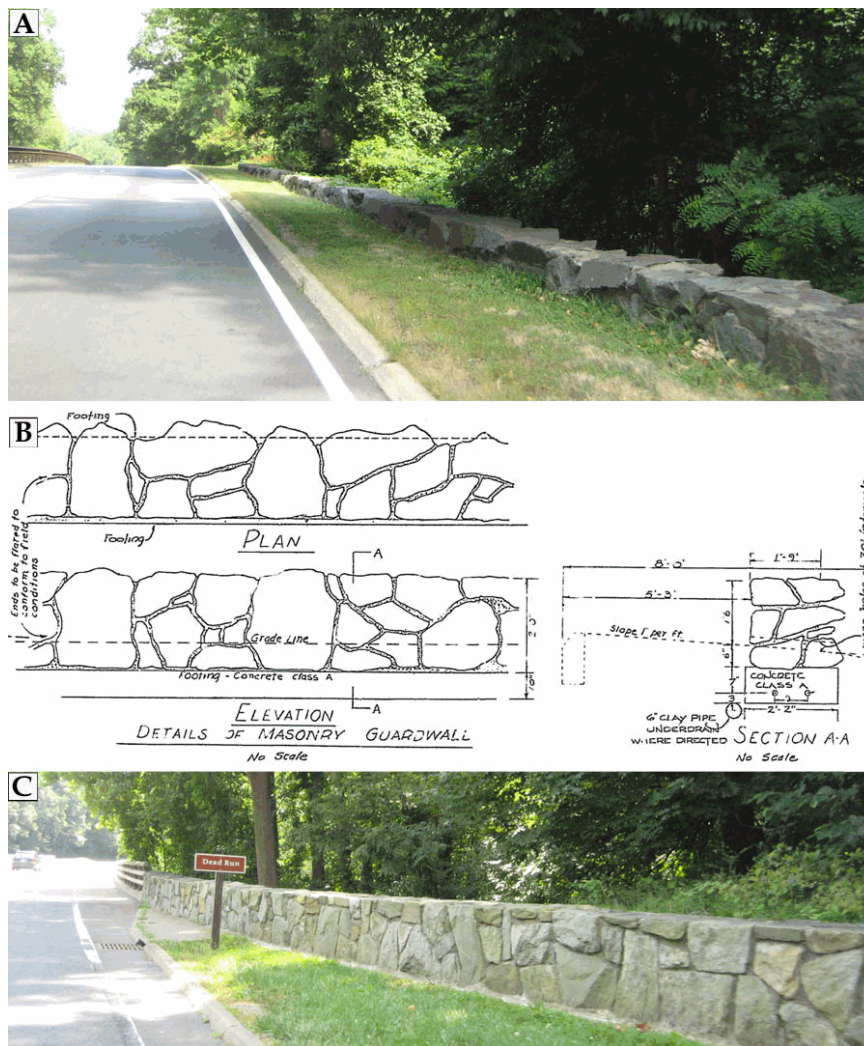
(a) Stone masonry guardwall 17N, north of Gulf Branch Bridge (NCR CLP 2009); (b) The 1961 construction plans for these walls, from the BPR (DSC TIC 850/1417); and (c) Non-contributing guardwall 33N, south of Dead Run Bridge (NCR CLP 2009).
